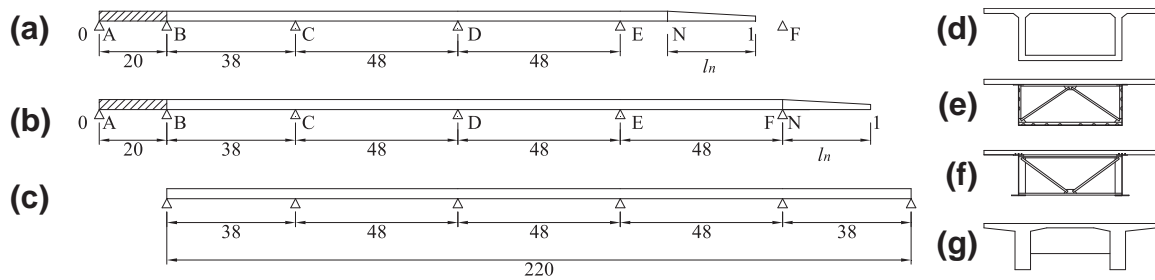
Bridge launching and typical deck cross-sections. (a) EF span launching before the nose reaches the pier. (b) Launch completed over EF span. (c) Bridge in its final configuration. (d) Concrete box. (e) Steel box with concrete slab. (f) Steel I girders with concrete slab. (g) Concrete T girders with top slab.
